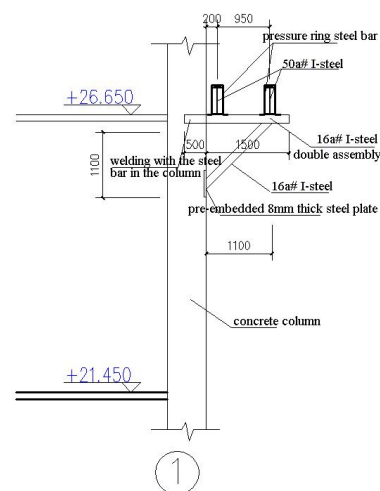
Profile of Formwork Support for Erection of Section Steel Main Beam
